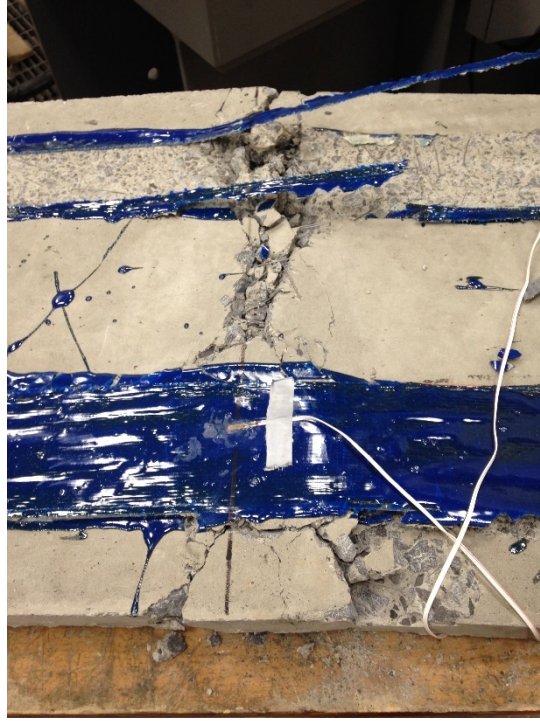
Panel SAI2 post-residual strength testing. Fracture and debonding of one FRP strap, large cracks and spalling of concrete.
